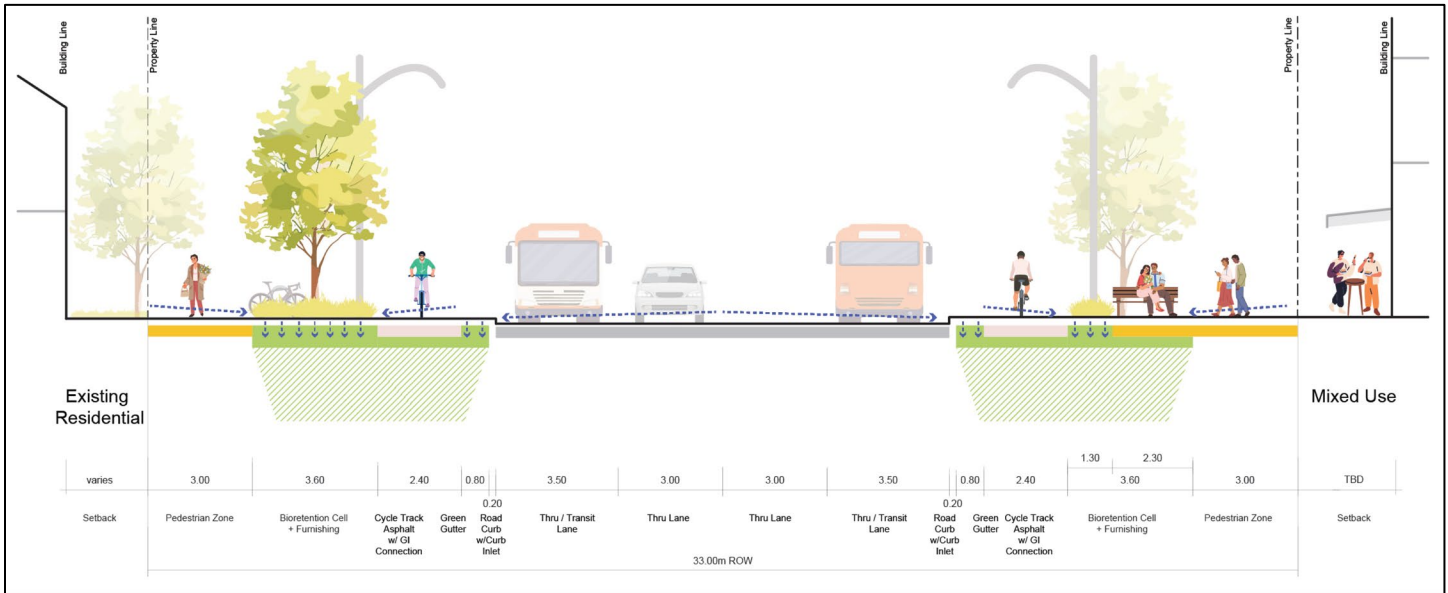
Existing Dufferin Street (Wilson Avenue to Beffort Road) Cross-Section - Option 1
